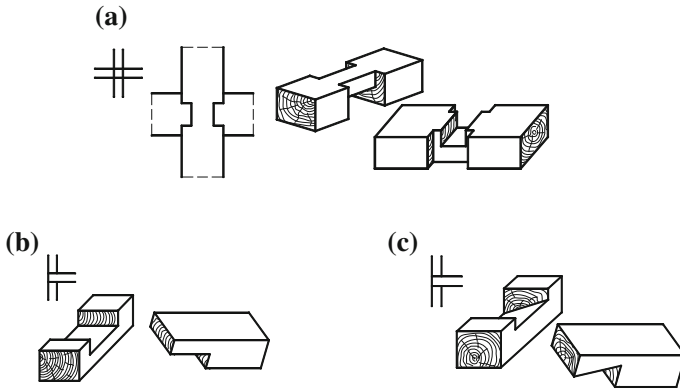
Connections of beams at angle according to Obmiński in [3], a straight lap with auxiliary element, b straight lap, c slanting lap
